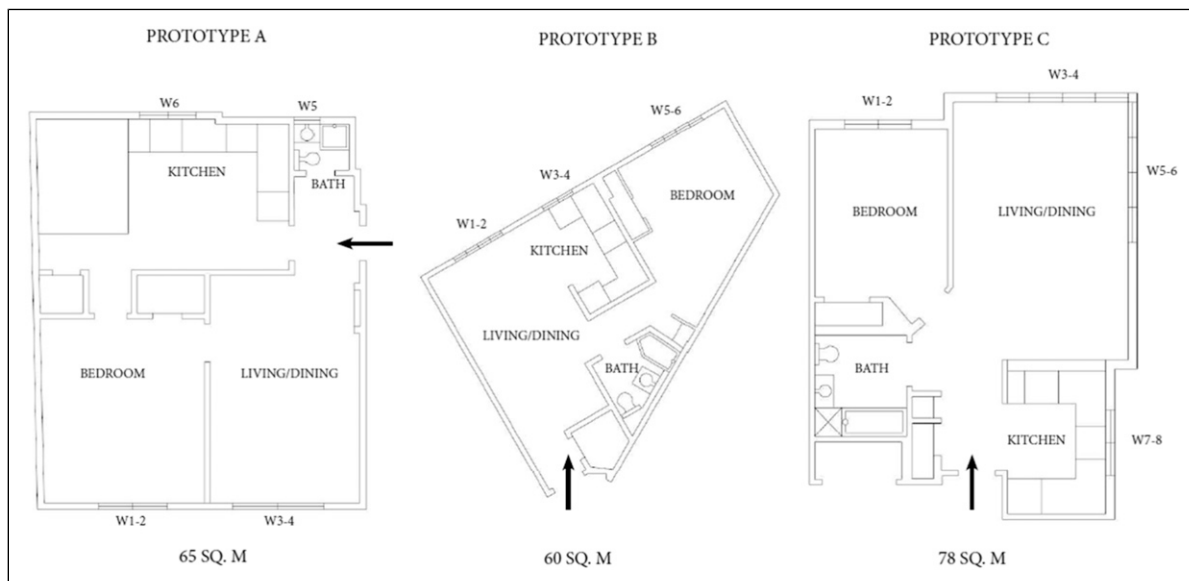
Typical apartment layouts for 1-bedroom units from each study site (A, B and C).
